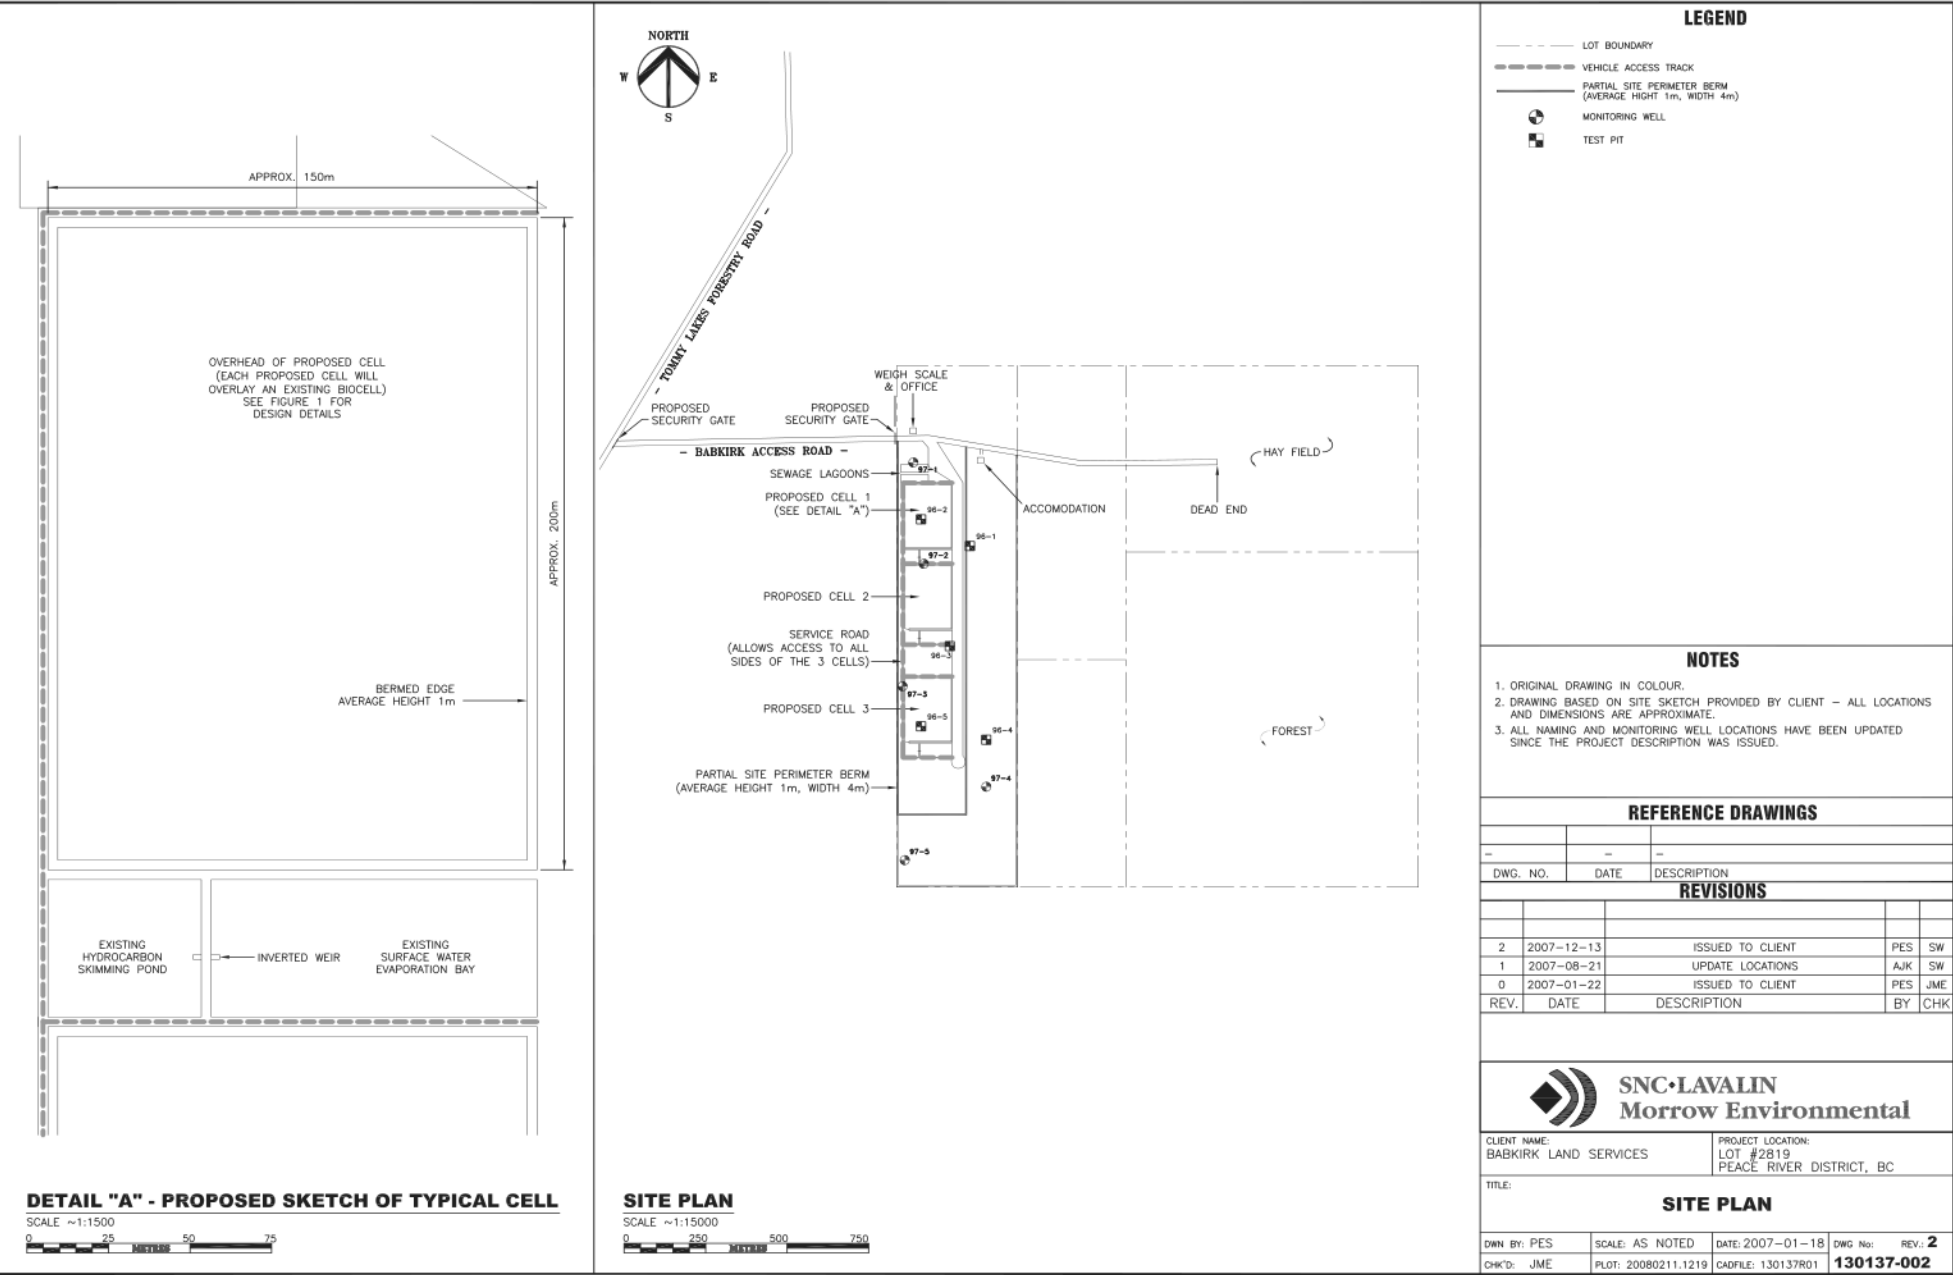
Site Plan for New Babkirk Secure Landfill and Hazardous Waste Storage and Treatment Facility
